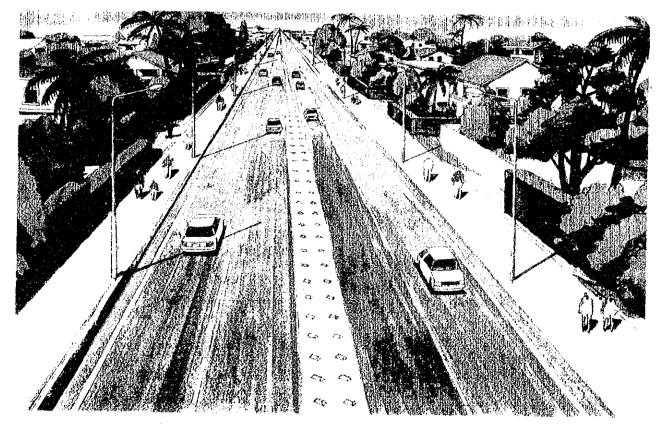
Typical Cross Sections of Proposed Roads
